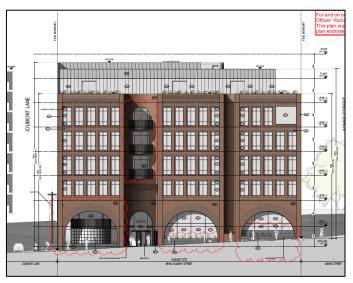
extract of the endorsed south elevation for TP-2018-1175 at 86-94 Jolimont Street (Source: Council)
